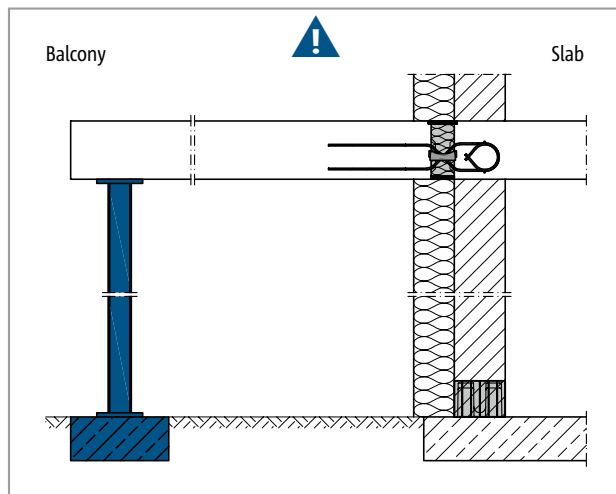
Schöck Isokorb® T type Q-VV: Support required at all times
